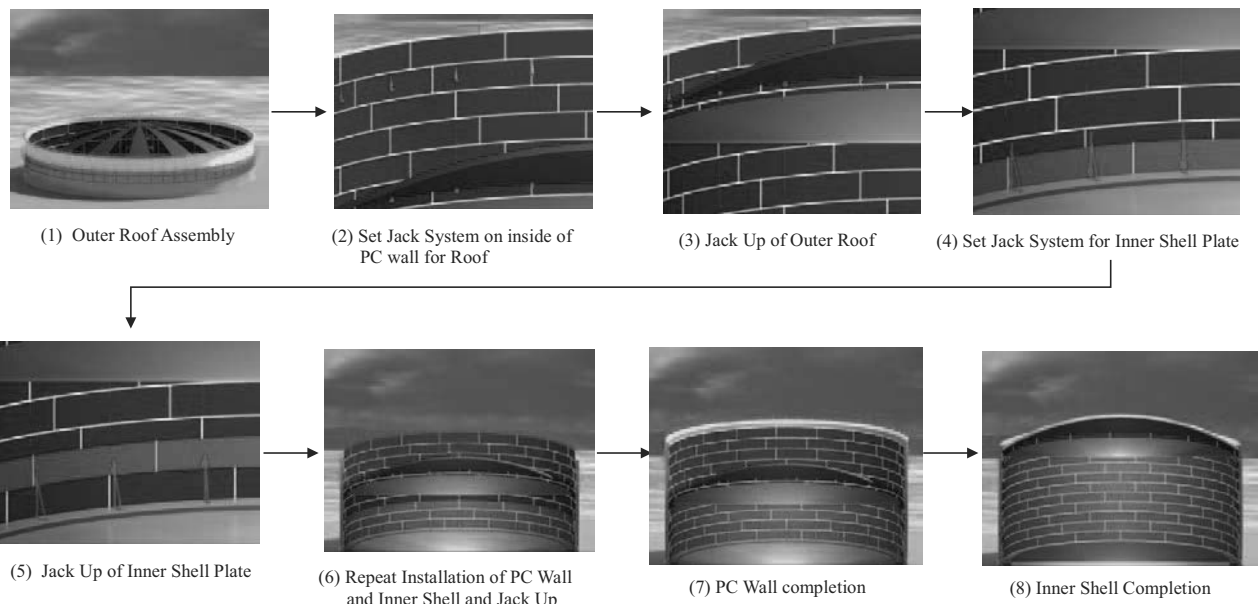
Construction of JCM (Outer roof with suspended Deck)
